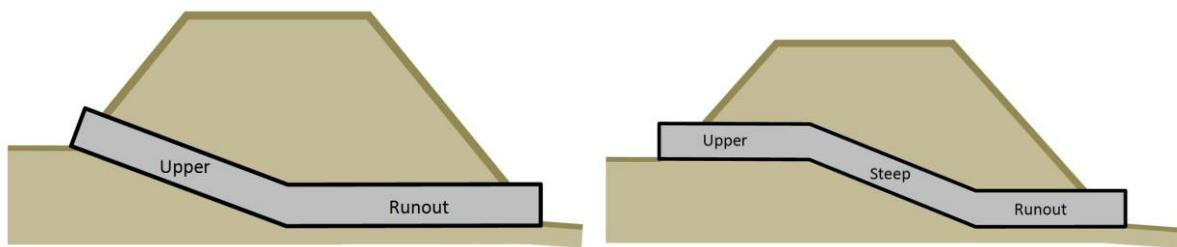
Definition sketch for culvert barrels in a broken back culvert crossing
